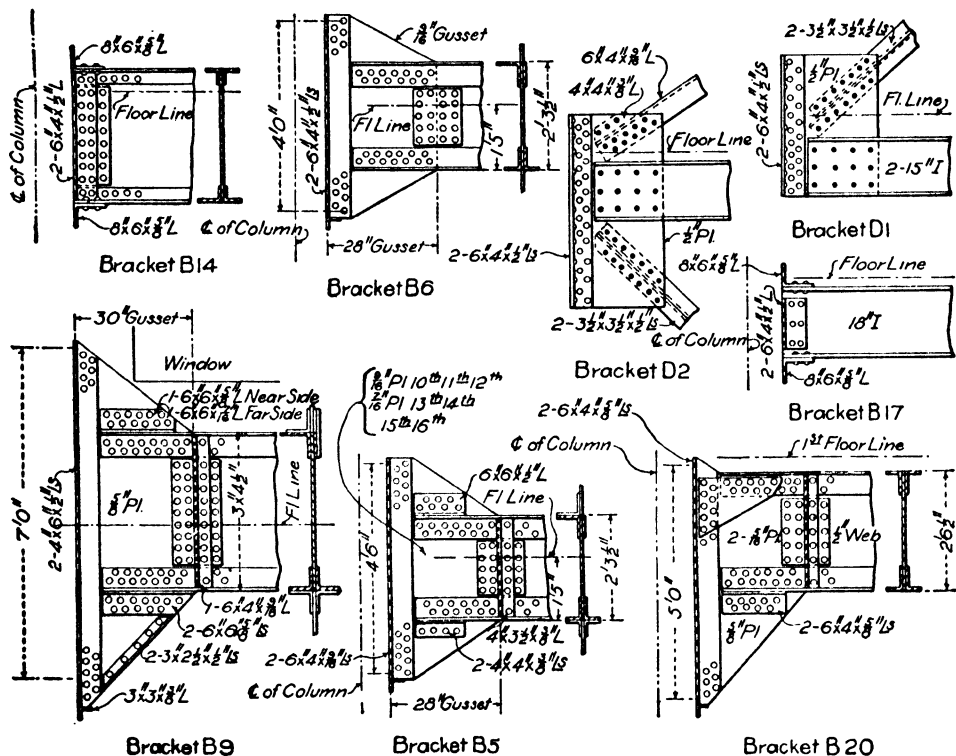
DETAILS OF WIND BRACING IN UNITED FIRE COMPANY'S BUILDING.
